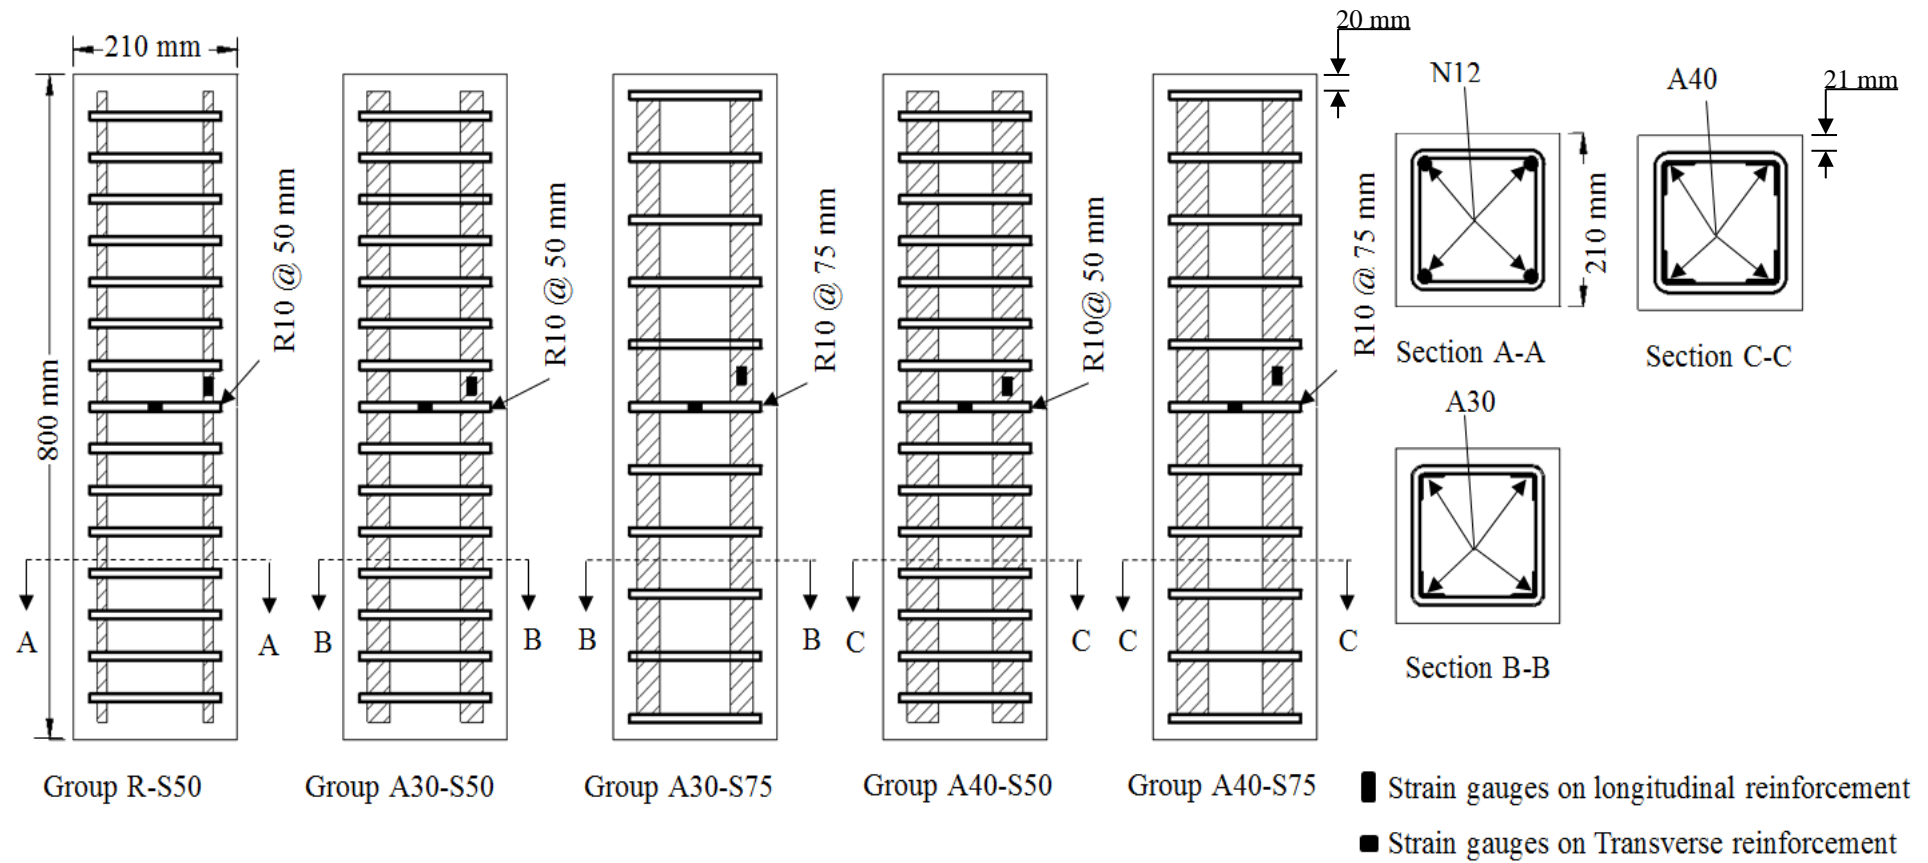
Dimension and reinforcement arrangements of the test specimens with 800 mm height
